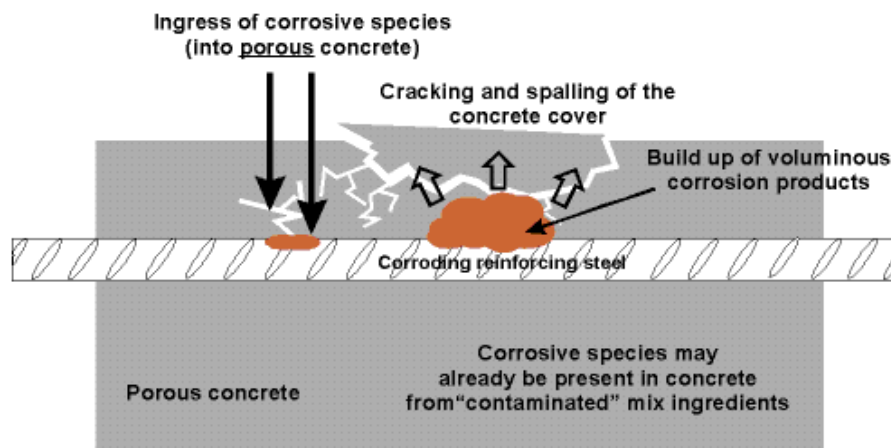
corrosion of rebar in concrete (Tullmin, 2010)
